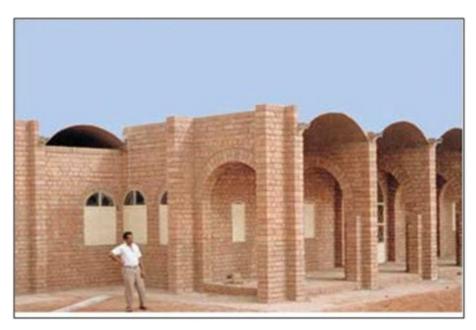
A Building made of Compressed Stabilized Earth Blocks Source: Adam and Agib, 2001
